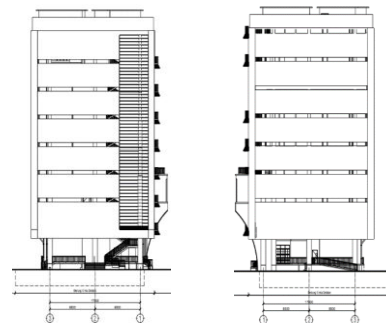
East – West Elevation of LABTEK XV using building envelope and low WWR
